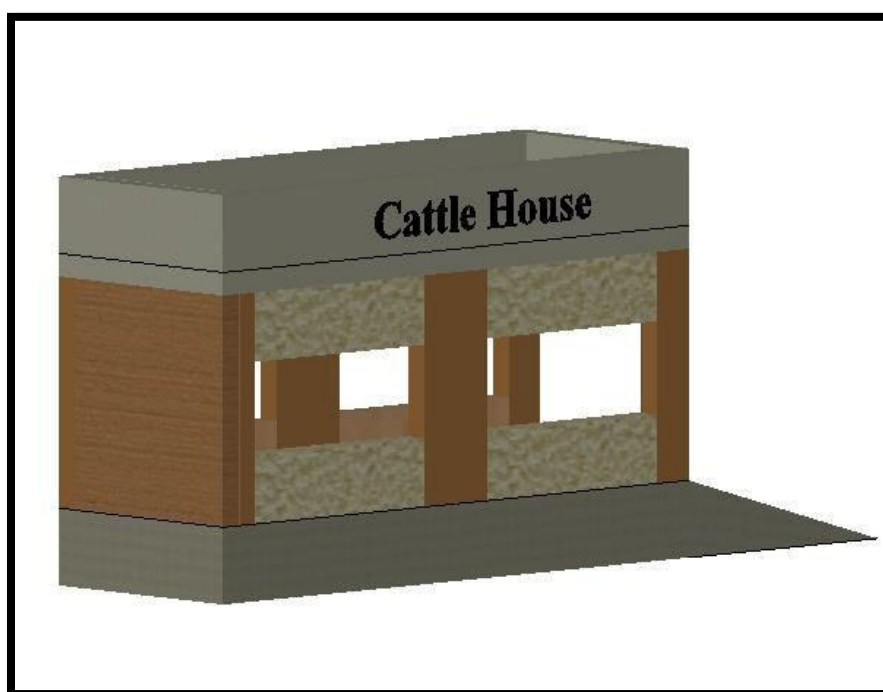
3D VIEW OF PLAN OF CATTLE HOUSE
